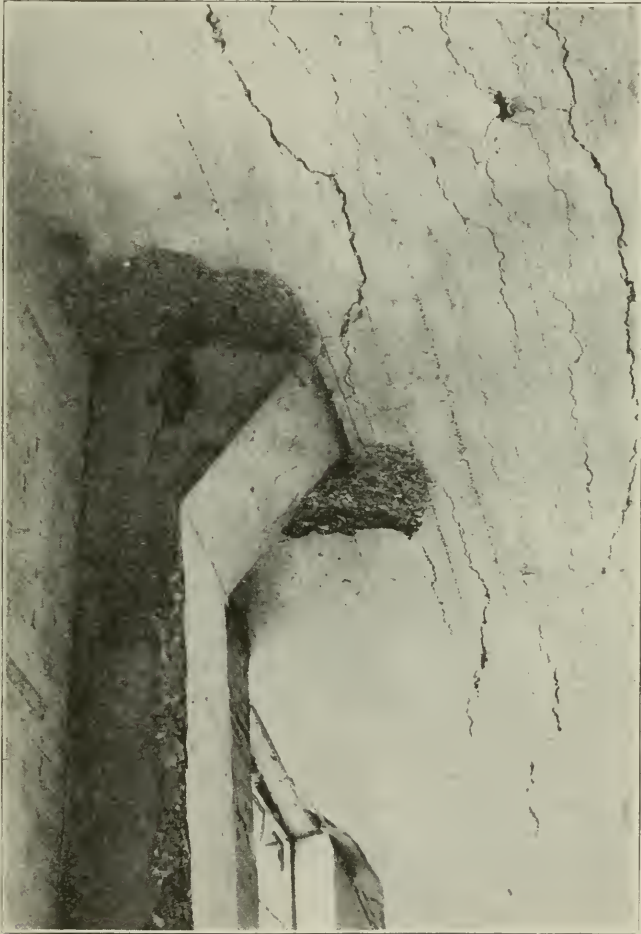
Wall Slab at Bracket Head, showing Lack of Support at That Point.
